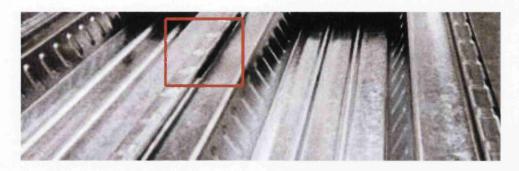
Cracking in the dovetail section of a profiled deck.
